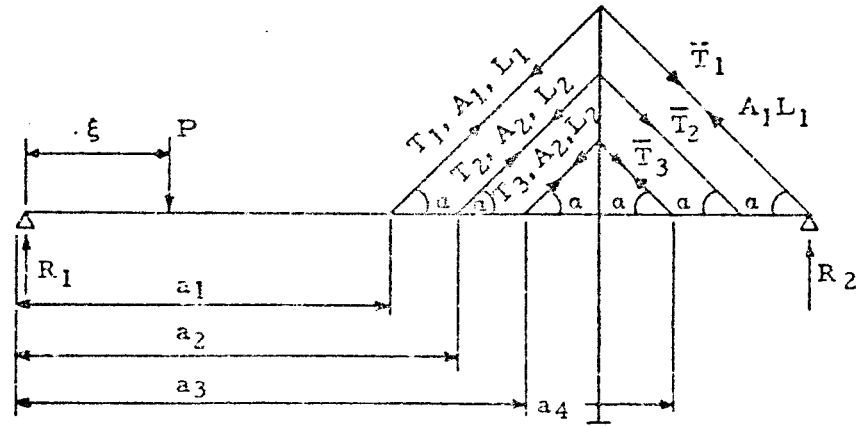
STAYED GIRDER BRIDGE, ELEVATION VIEW
